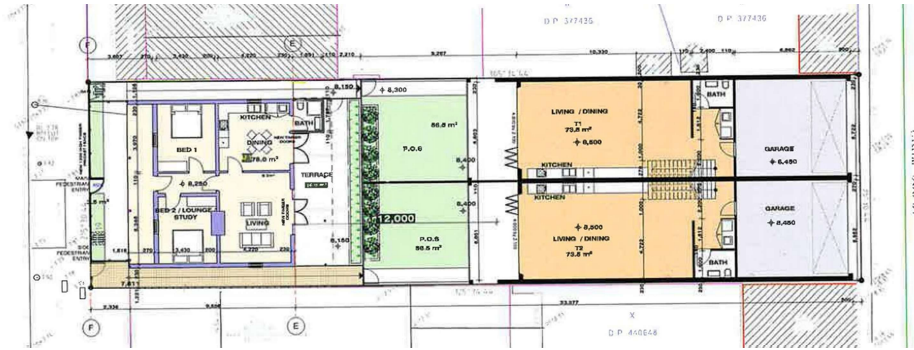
Ground floor plan showing the proposed changes to the cottage and the layout of the terraces behind. (Source: Urbanlink)
